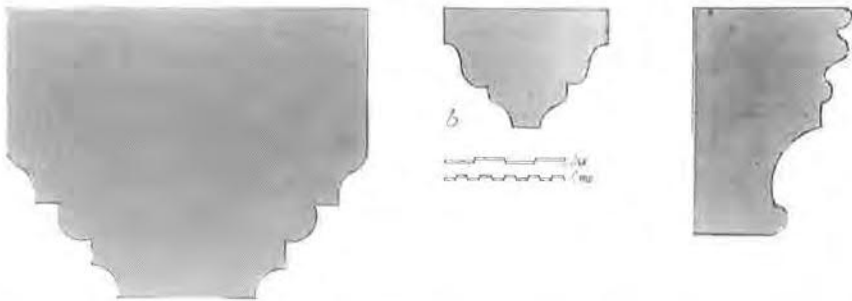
Fifteenth-century mouldings from Ceely House: (a) ground-floor spine-beam, (b) principal rafters and purlins, (c) cornice beam
